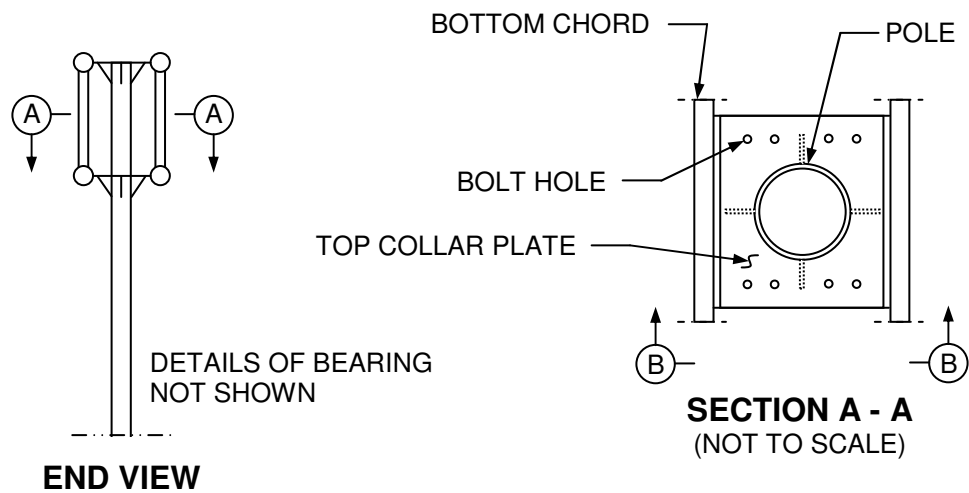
Typical Details for a Space Frame Support Pole on a Cantilever Sign Structure
